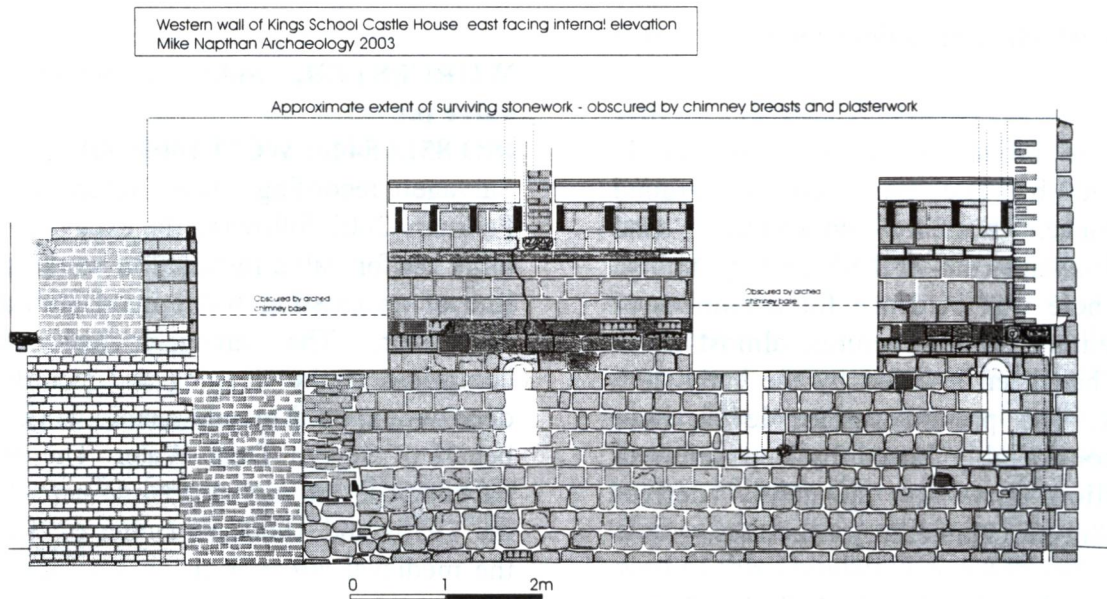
Western wall of Kings School Castle House, east-facing internal elevation
